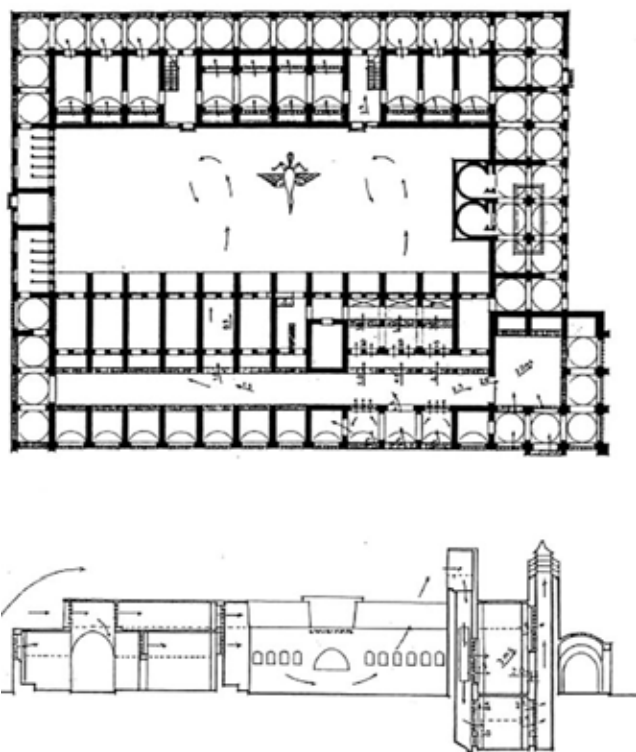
New Bariz Village, Market Plan and Cross-Section [2]
